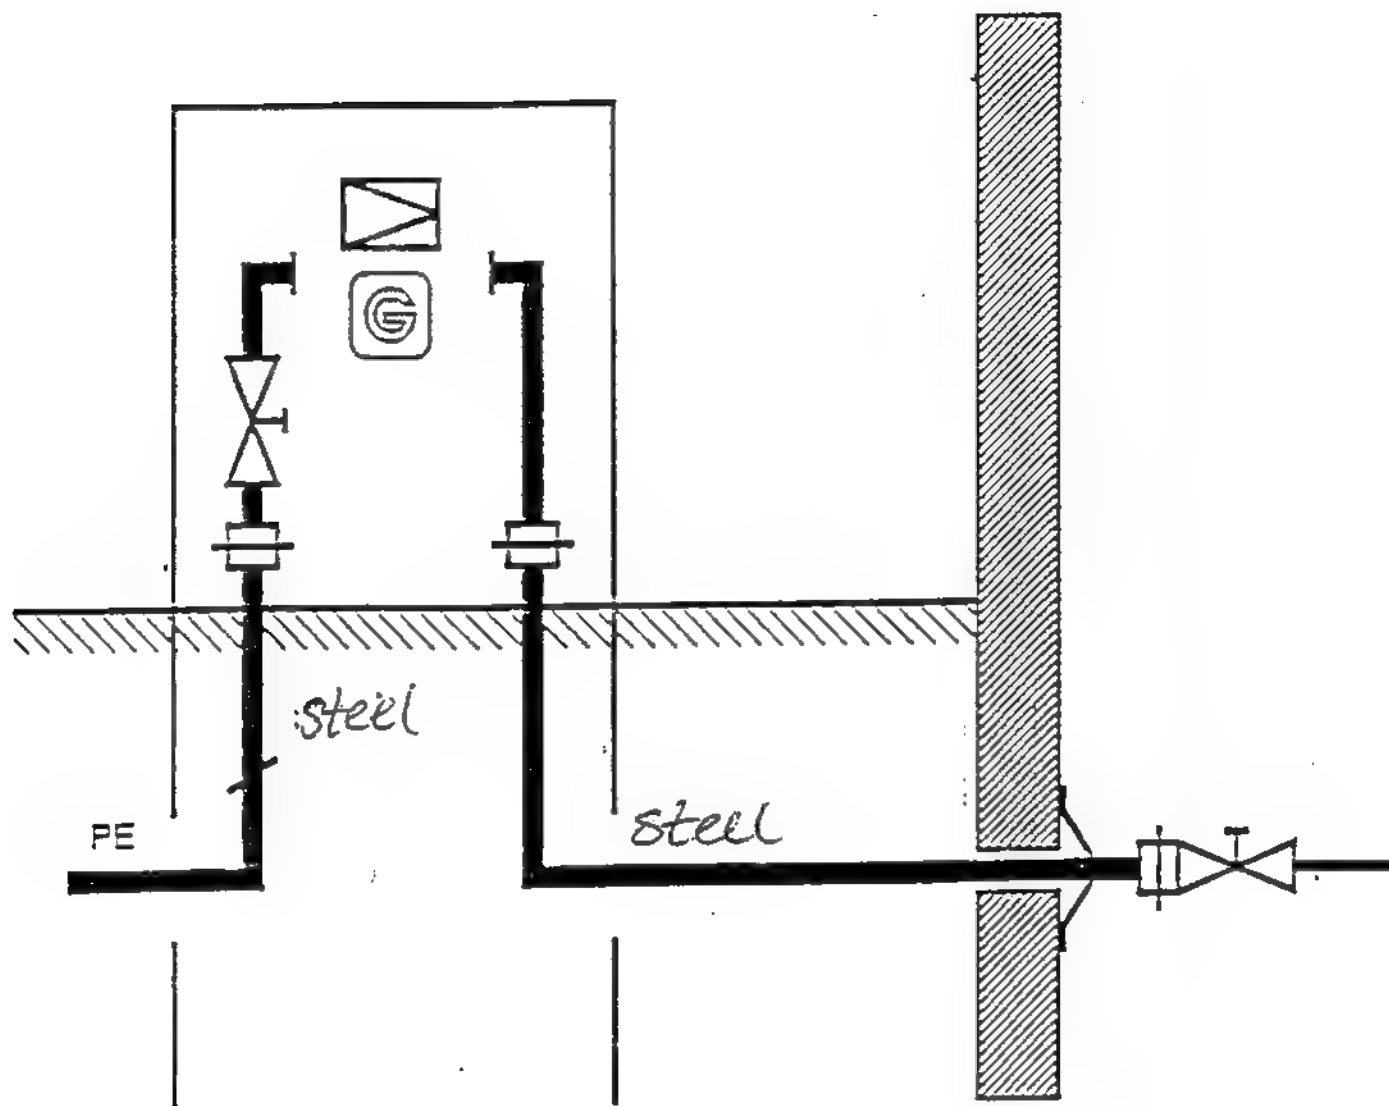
Insulating joints in detached control box and/or meter case made of metal or concrete (foundations made of reinforced concrete) - house-connection line made of PE - transition to steel immediately at the inlet into the box (case)
